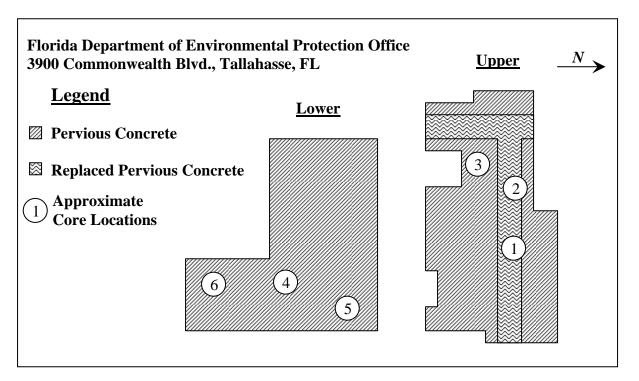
Florida Department of Environmental Protection Parking Lot Schematic (Not to Scale)
